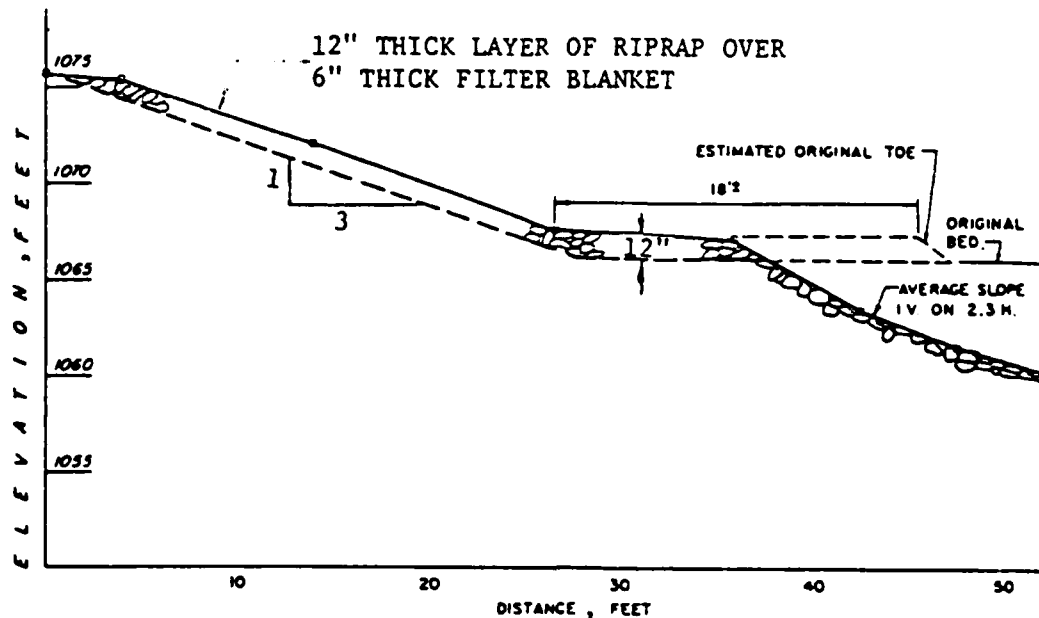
Republican River at Milford Dam Outlet Channel, Kans. Cross-sectional view of Test Section 3 shown as constructed in 1969 and as surveyed in 1974.
